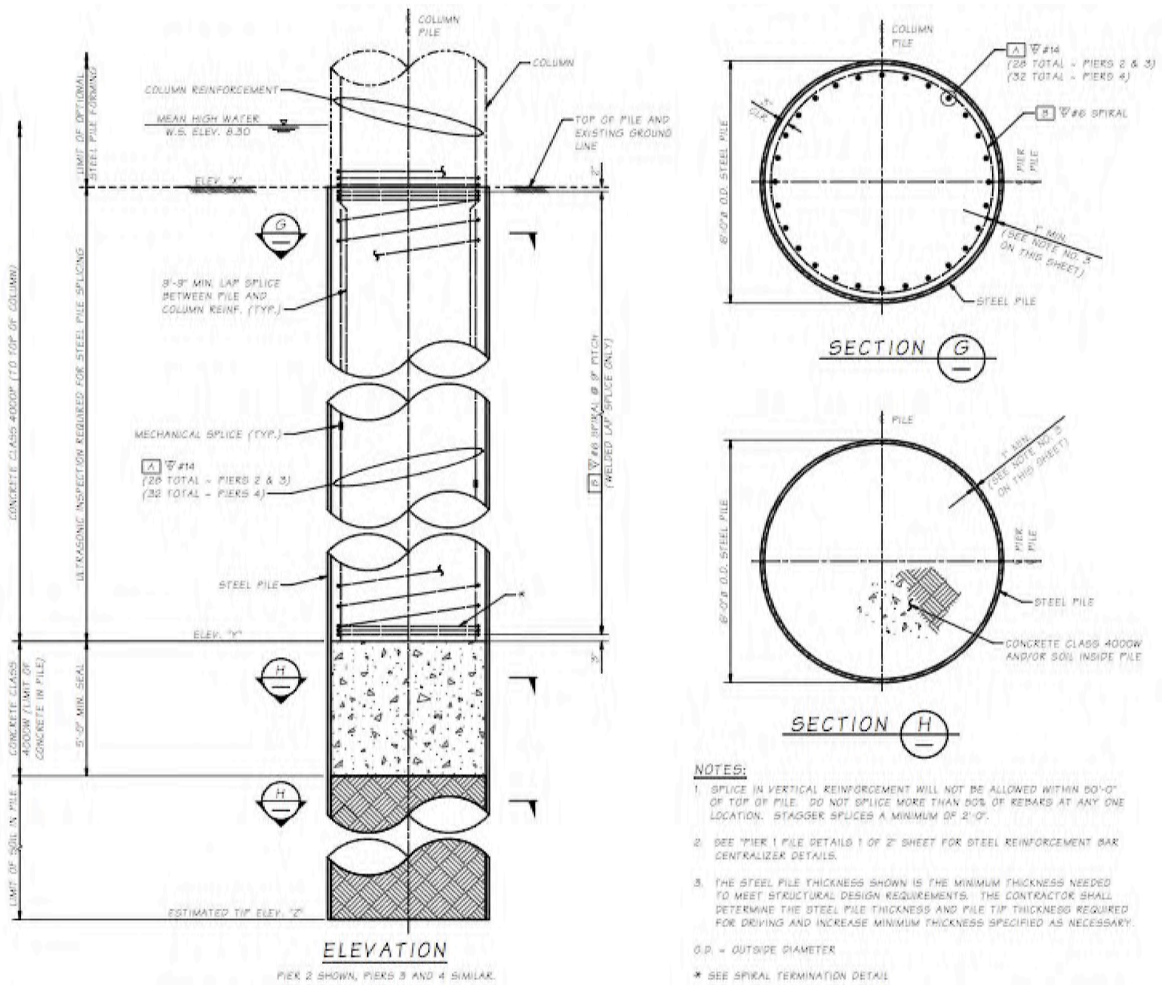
Pier No. 4 Caisson Ebey Slough
